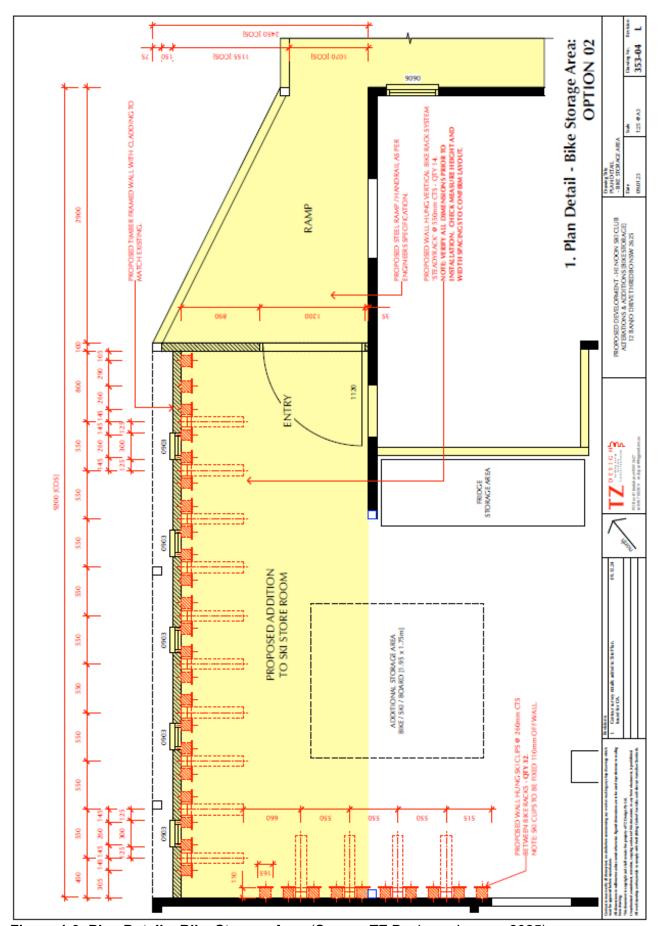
Plan Detail - Bike Storage Area (Source: TZ Designs, January 2025)
